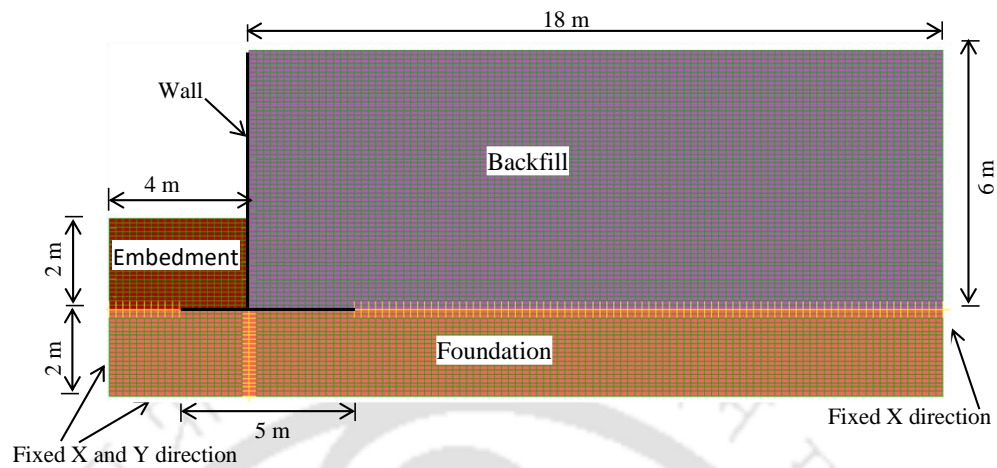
Numerical diagram of full-scale cantilever retaining wall model
